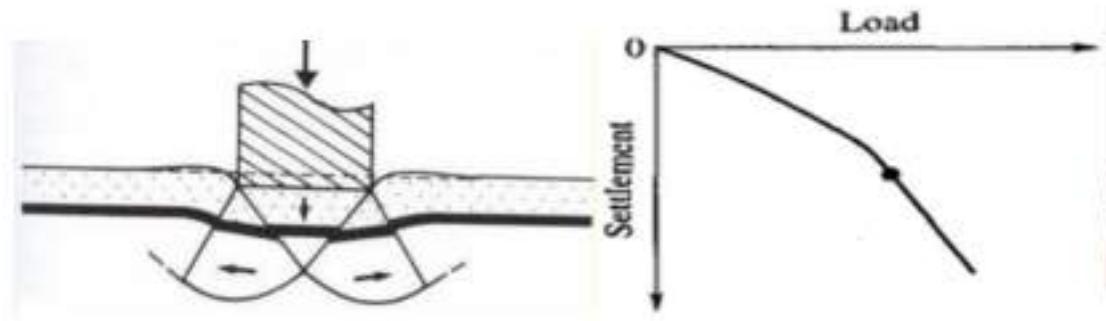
Shallow Foundation Bearing Capacity Failure (Local Shear Failure)
